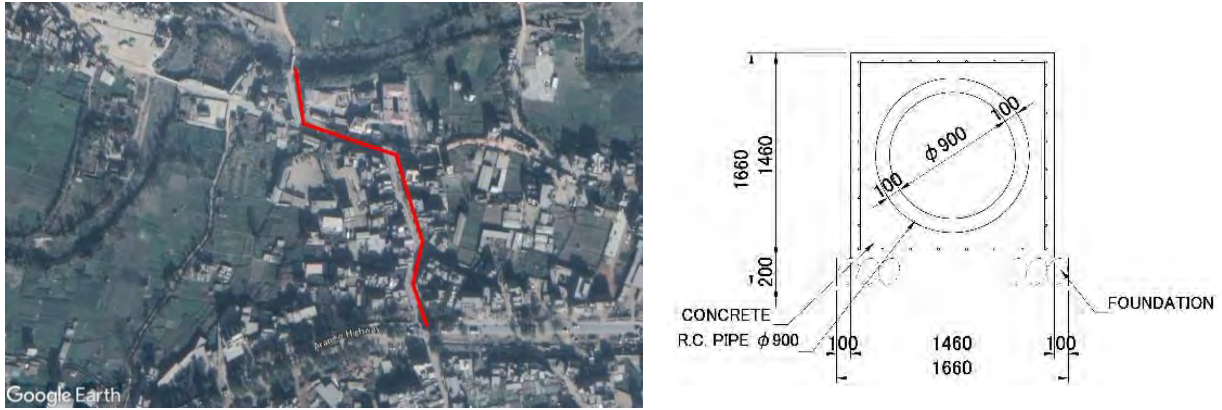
Basic idea of route of drainpipe from Jagati to a river
